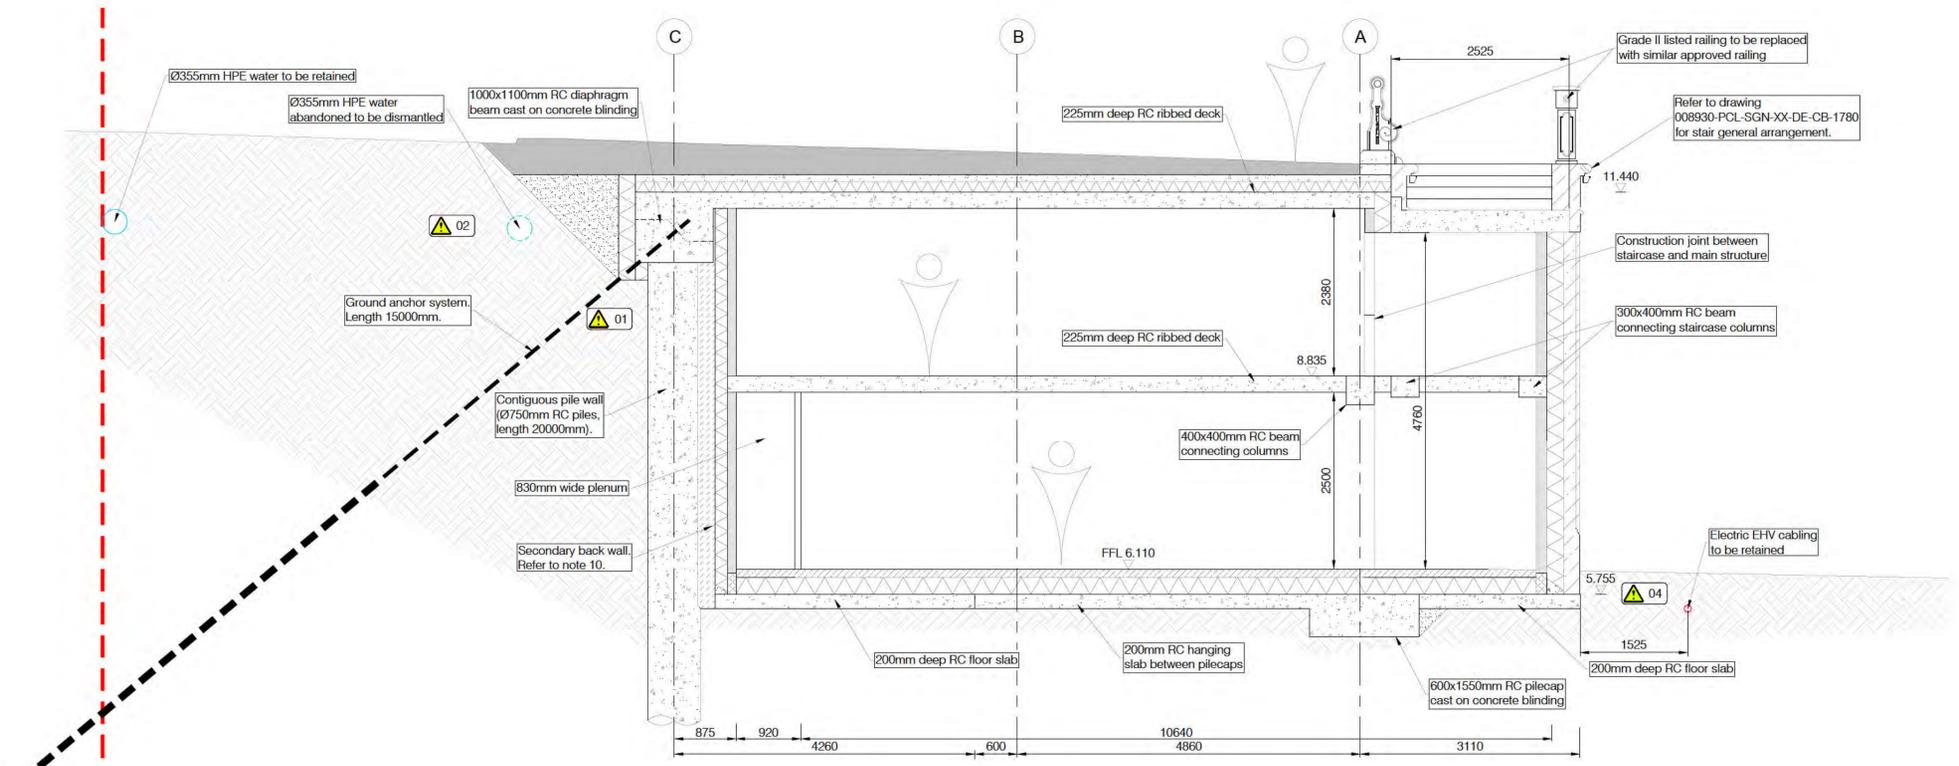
PCL-SGN-P05-DE-CB-0004
